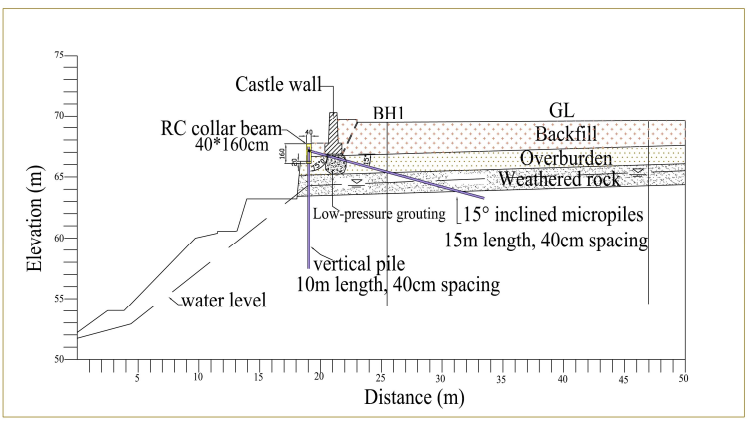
Details of Cross-Section A where underpinning strengthening and reinforcement are imposed for Castle Wall
